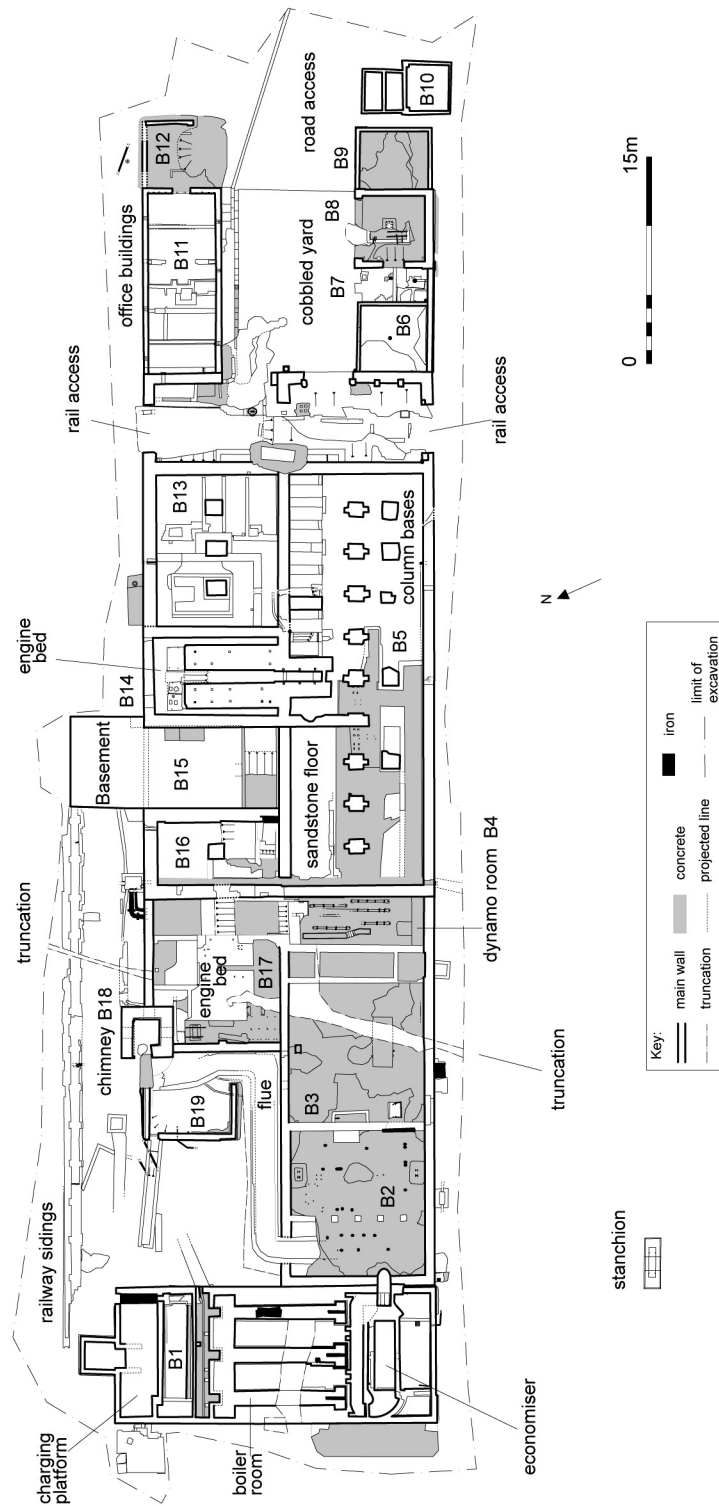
Building elements (B1-B19) and other features revealed during excavations.
